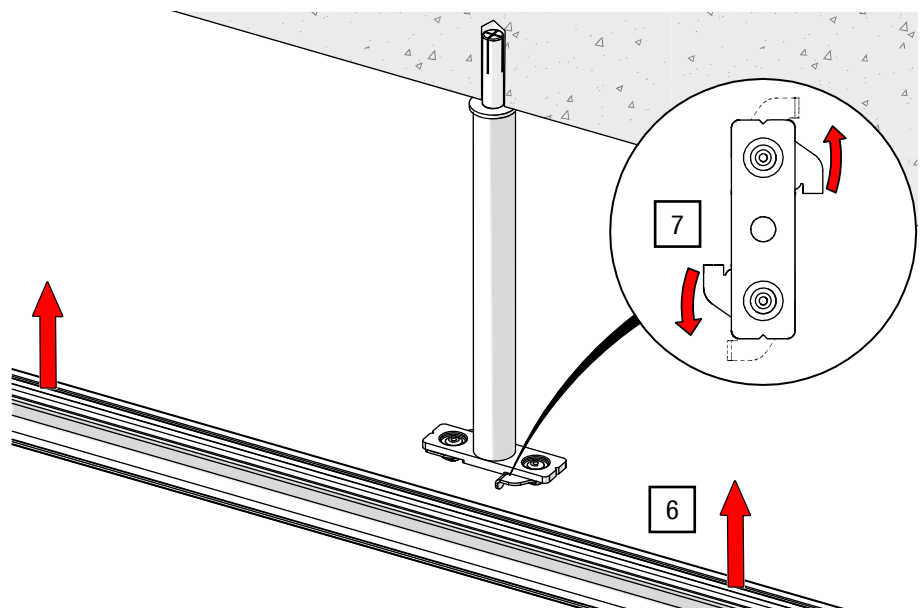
Ceiling suspension – Lift track and lock ceiling mount bracket
